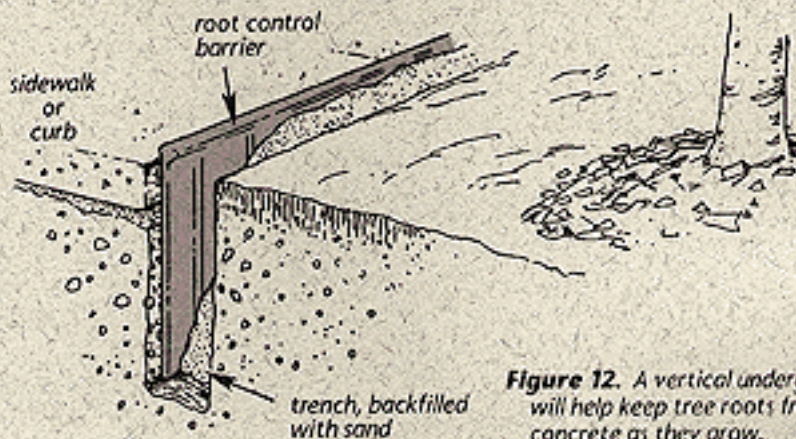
A vertical underground barrier will help keep tree roots from damaging concrete as they grow.
